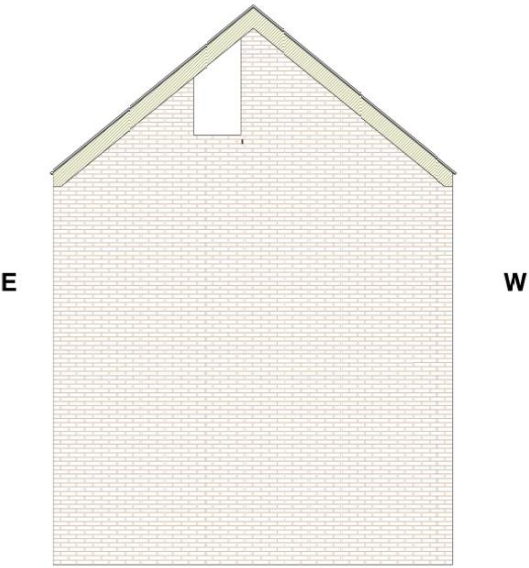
EQ-NPR 20% cracks – North clay façade.
